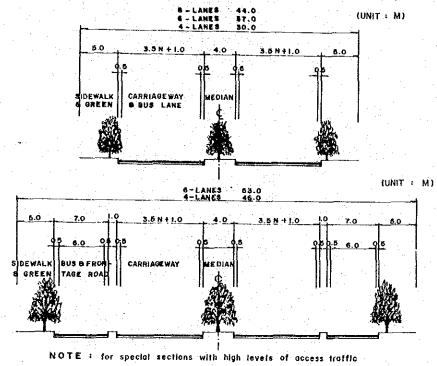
TYPICAL CROSS SECTION OF PRIMARY SYSTEM (2)
